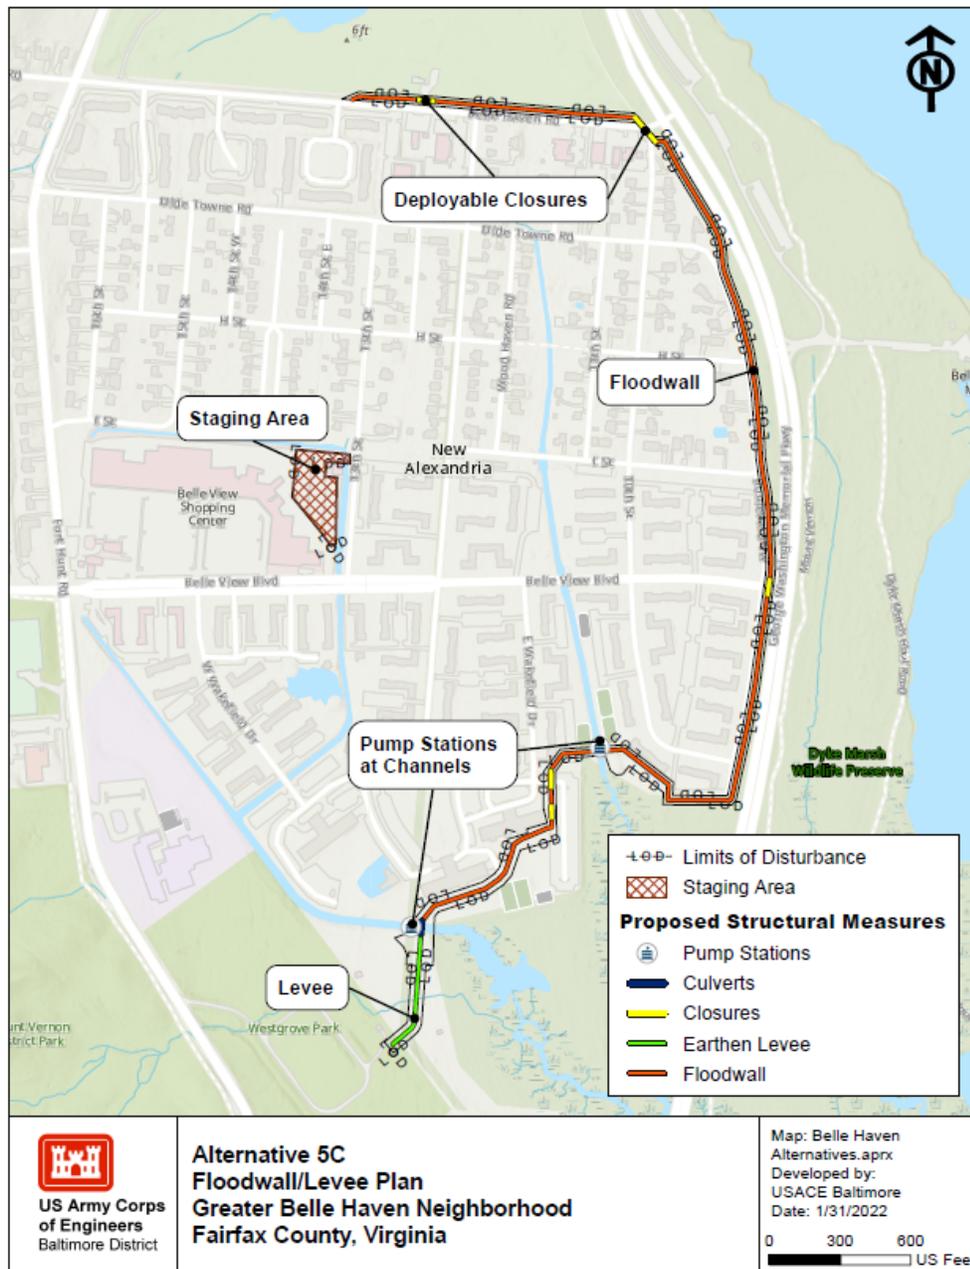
Alternative 5c: Belle Haven, Fairfax County Virginia
